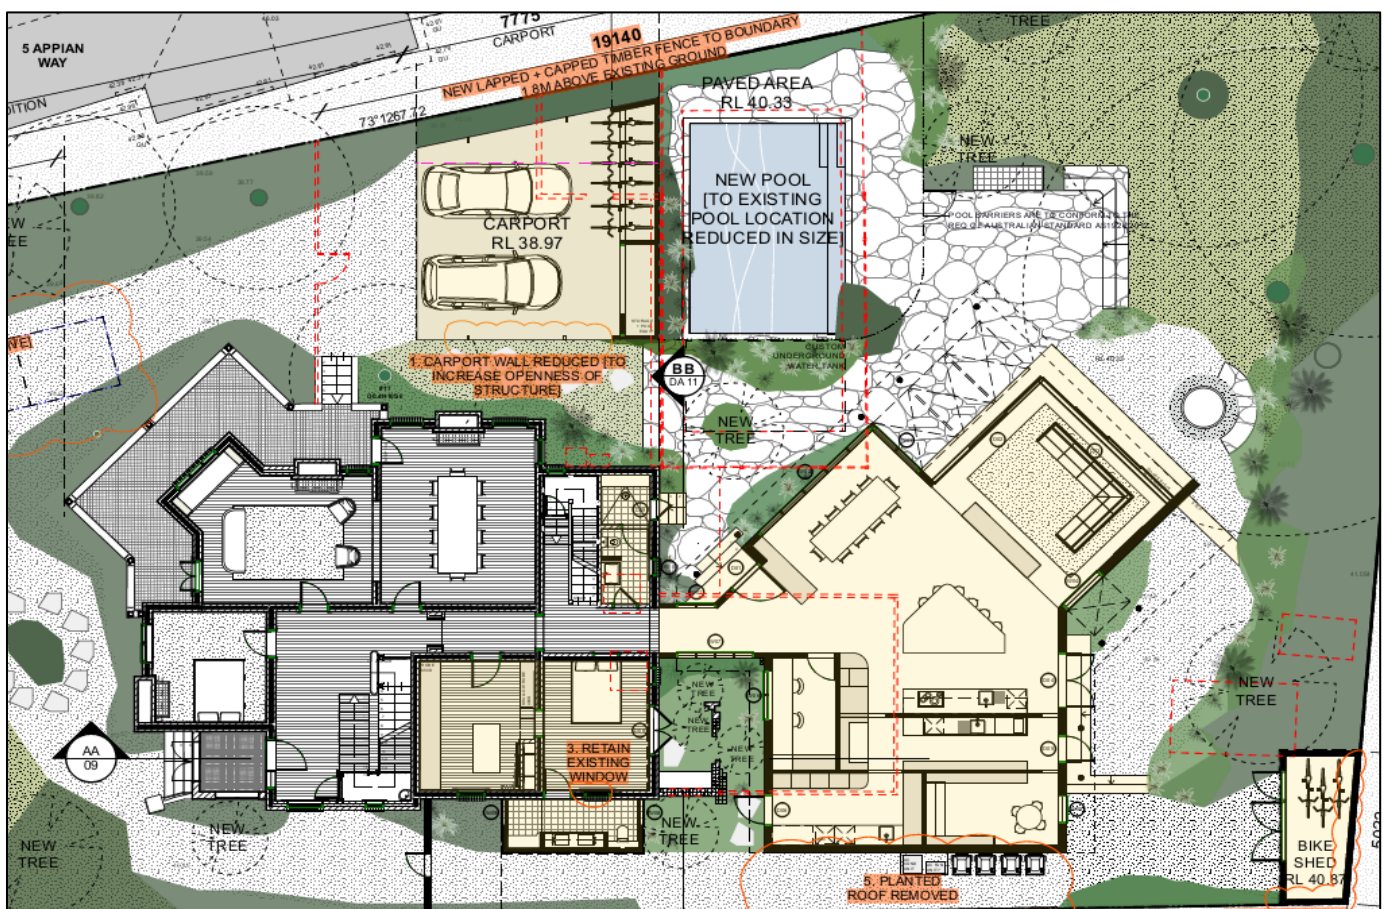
Extract of the applicant’s submitted revised Ground Floor Plan.
